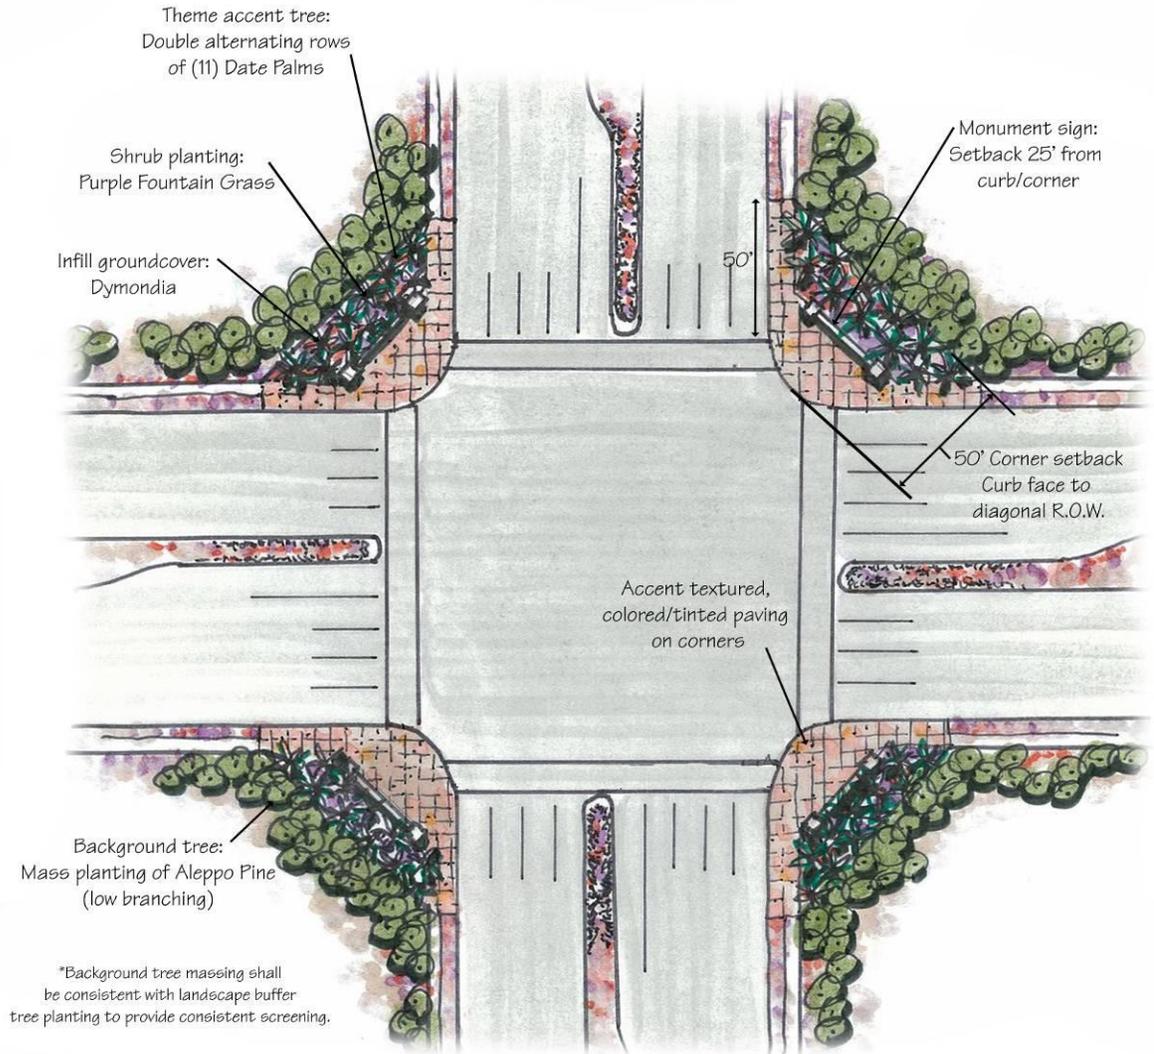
Primary Gateway Intersection Enhancement Concept
